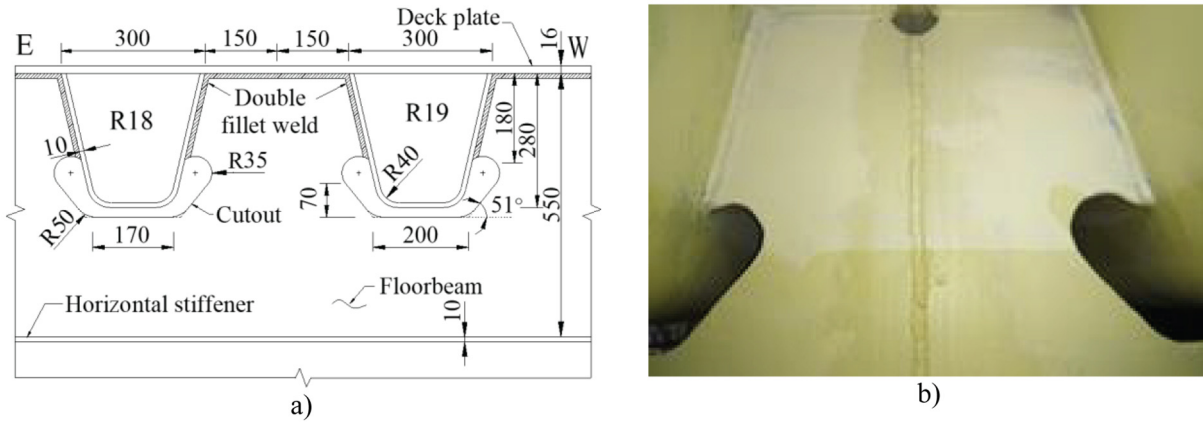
Retrofit cutout geometry, a) structural layout; b) on real bridge.
